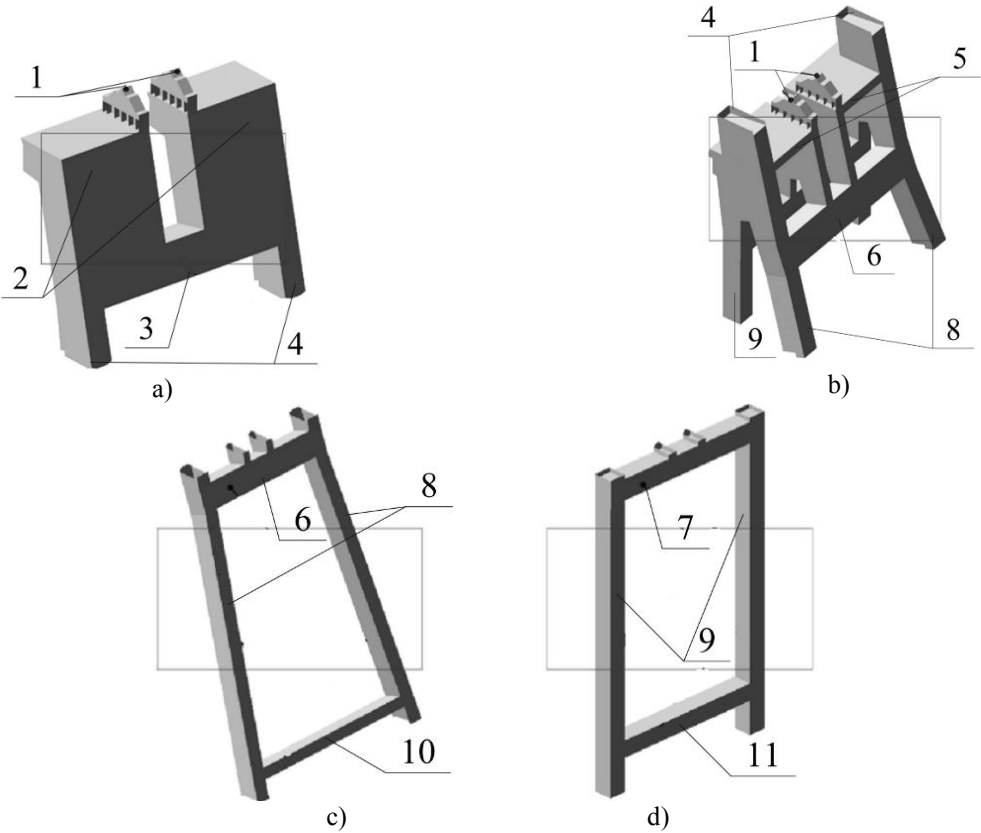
The major joints and elements of a frame-type box-like headgear: a) a segment of the upper sub-pulley structure; b) a segment of the lower sub-pulley structure; c) a segment of the upper part of a stay leg; d) a segment of the upper part of a vertical support (pillar). Component numbering: 1-support bearings of a pulley; 2 – a sub-pulley pillar of the upper sub-pulley platform; 3 – the main girder of the stay leg of the upper sub-pulley platform; 4 – the branches of the stay leg between the sub-pulley platforms; 5 – a pillar of the lower sub-pulley platform; 6 – the main girder of the stay leg of the lower sub-pulley platform; 7 – the main girder of the vertical supports of the lower sub-pulley platform; 8 – the stay leg branches; 9 – the vertical support body; 10 – the stay leg girder; 11 – the girder of vertical supports)
